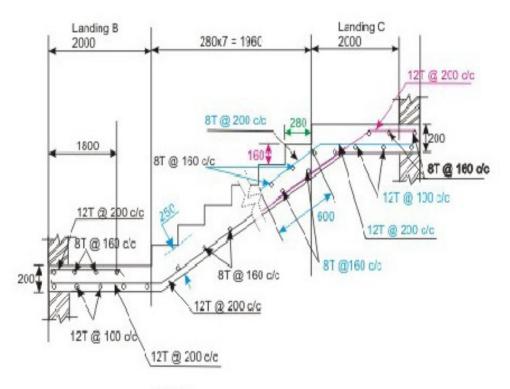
Reinforcing bars, sec 2-2 of Fig 9.20.21, Example Q.8
